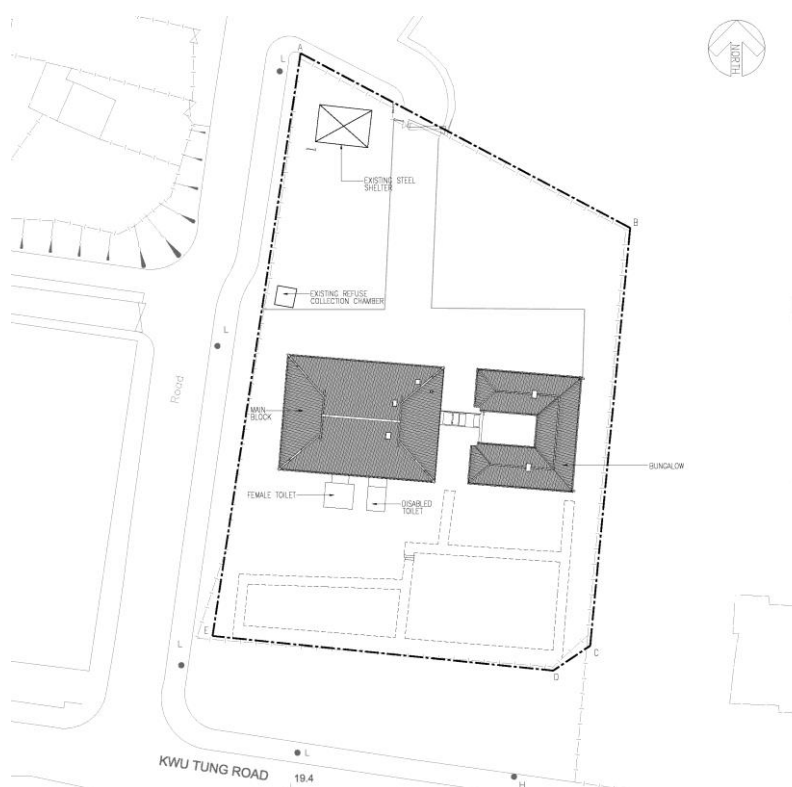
The existing site plan of LHTWC. Edited by Hannah Liu.
